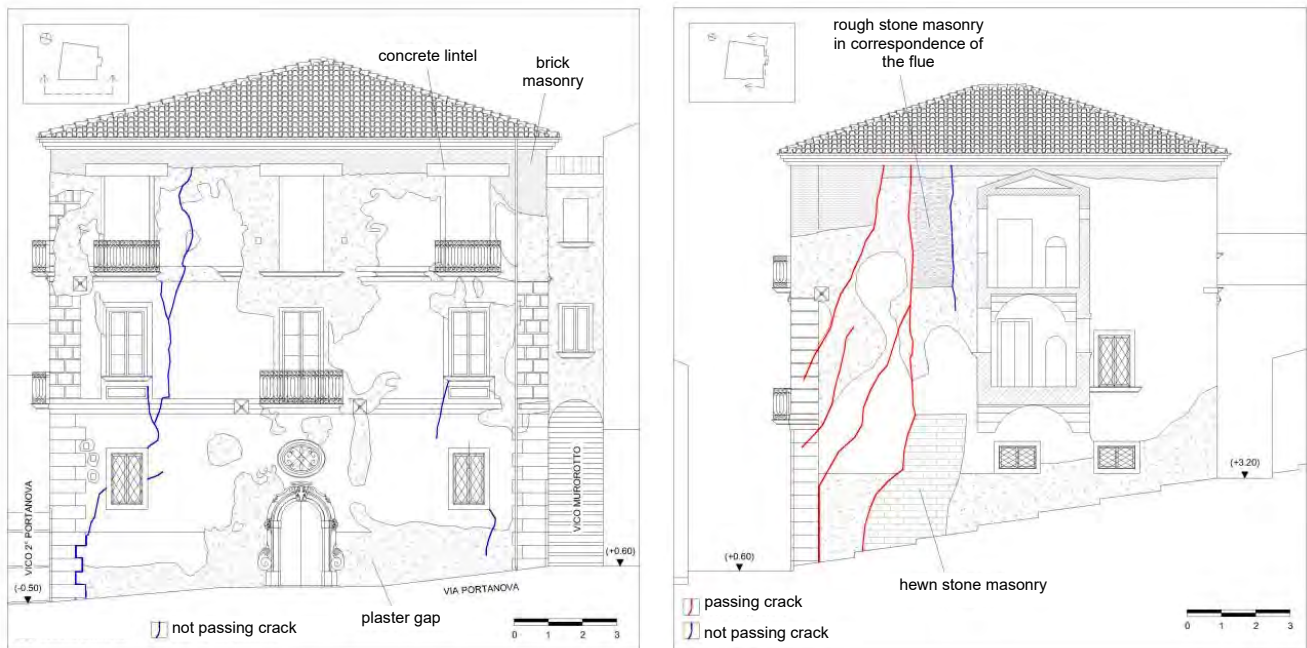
Crack pattern of the overturning main façade: South elevation (on the left) and East elevation (on the right)
